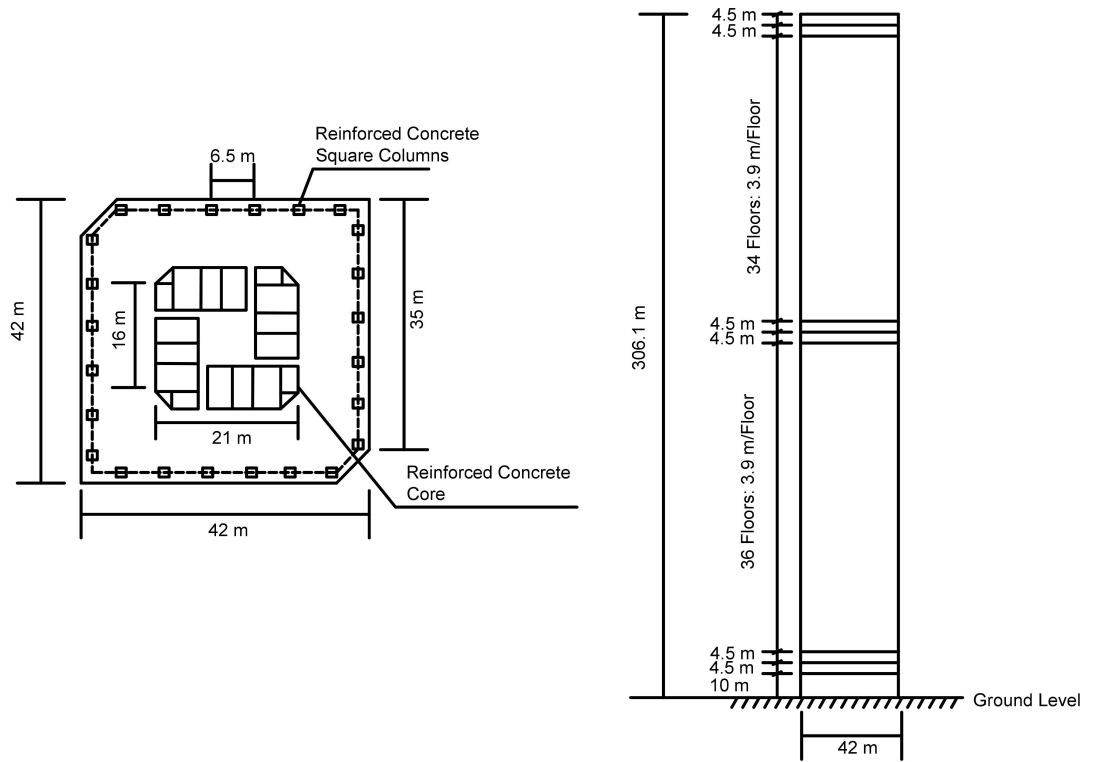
Plan and elevation views of the 76-story building (after Yang et al. (2004)).
